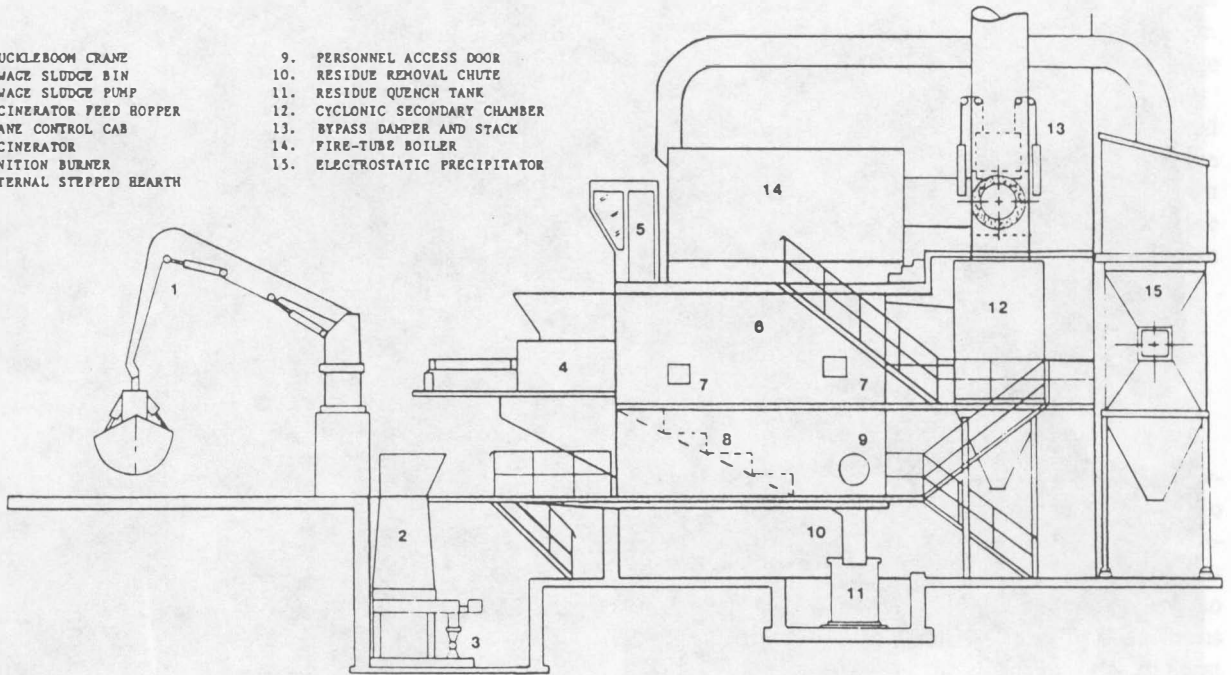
EQUIPMENT CROSS SECTION LAYOUT
